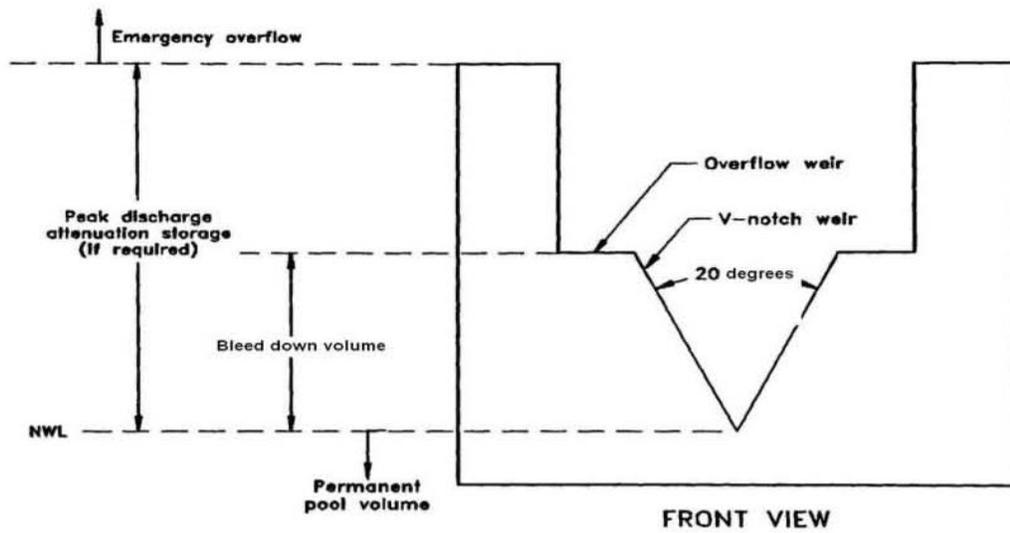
Typical Wet Detention Outfall Structure with "V"-notch Weir (N.T.S.).
